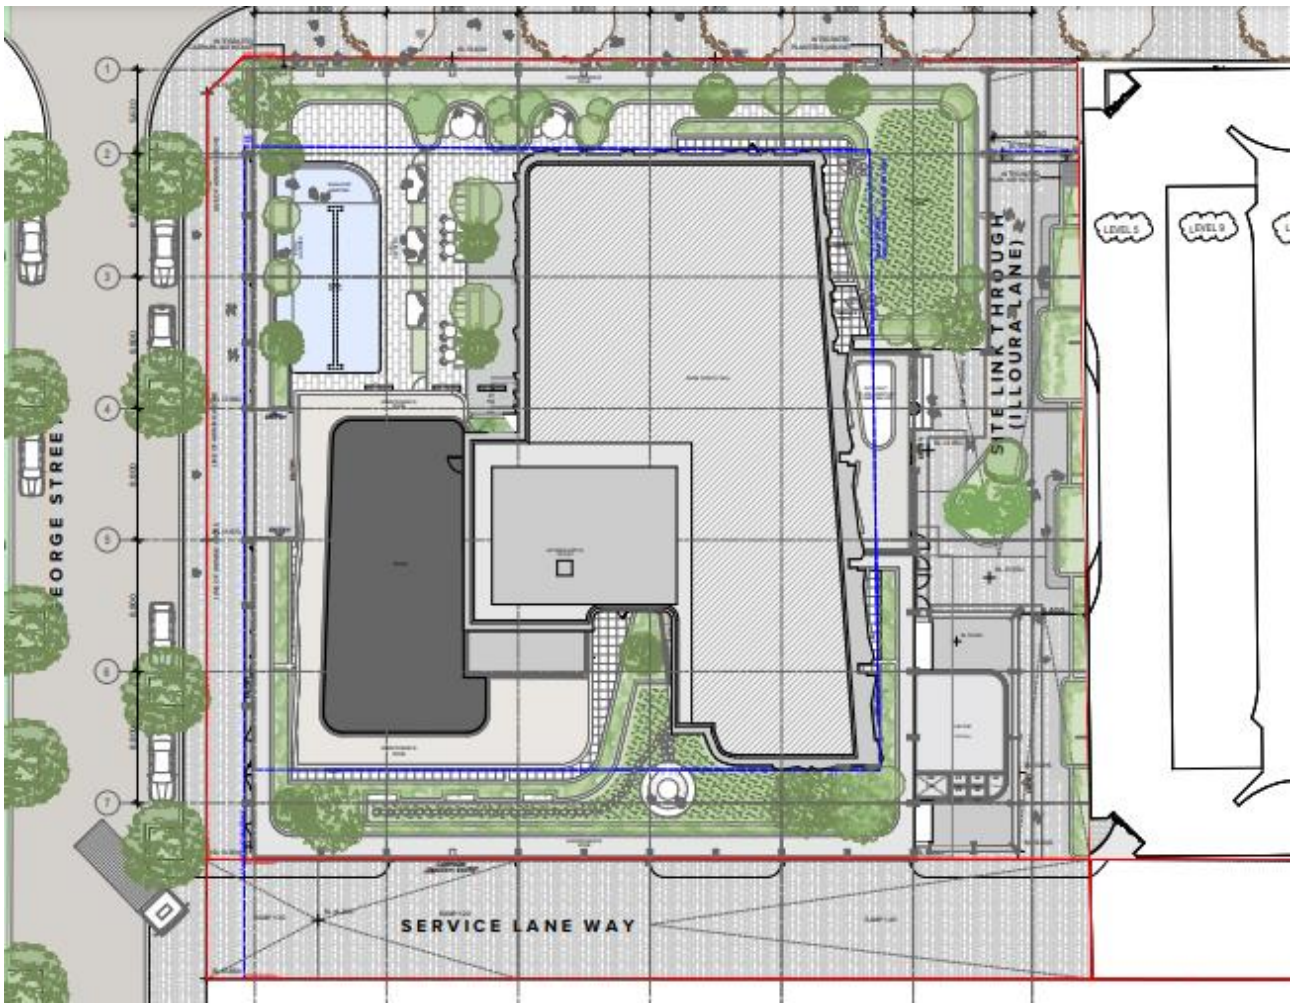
Site plan, Illoura Place, 28 Elizabeth Street, Liverpool.
